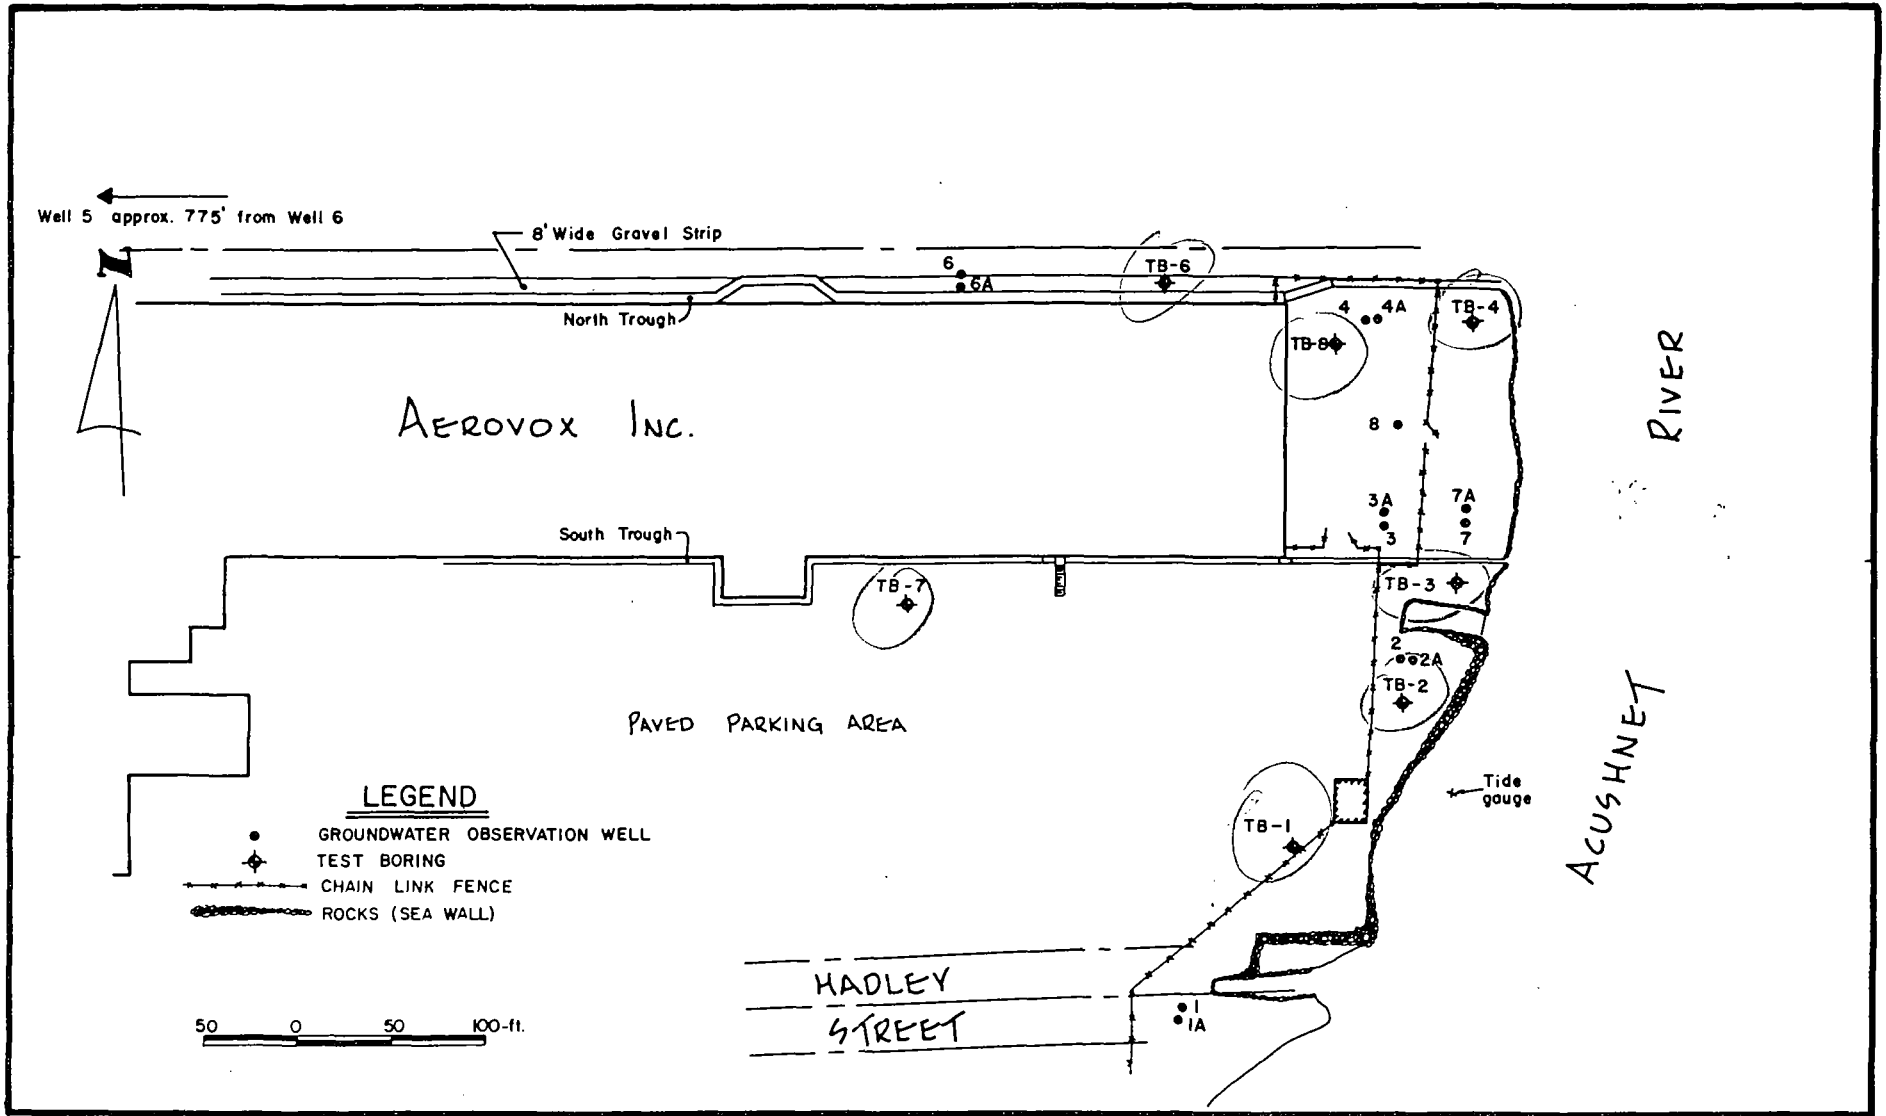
SITE PLAN SHOWING TEST BORING AND OBSERVATION WELL LOCATIONS
